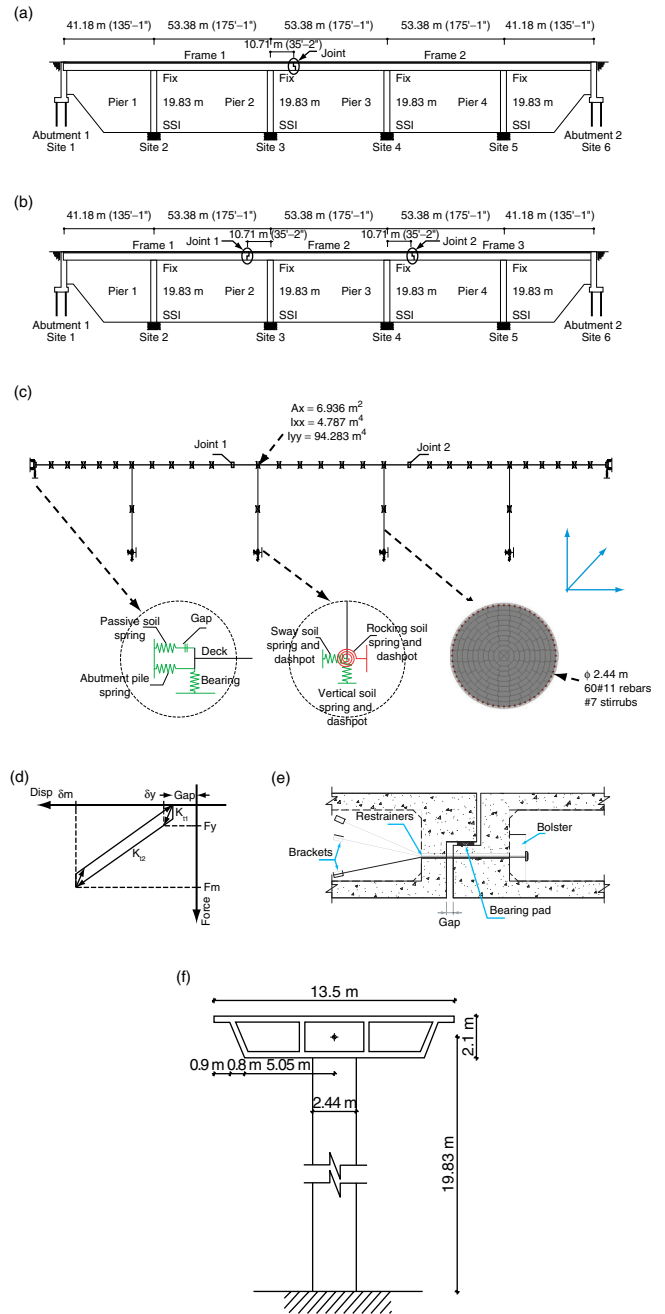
Bridge Models used for the study: (a) Bridge 1 (with a single expansion joint); (b) Bridge 2 (with two expansion joints); (c) finite element model of Bridge 2; (d) analytical model of impact element; (e) typical joint detail; and (f) bridge cross sectional details
